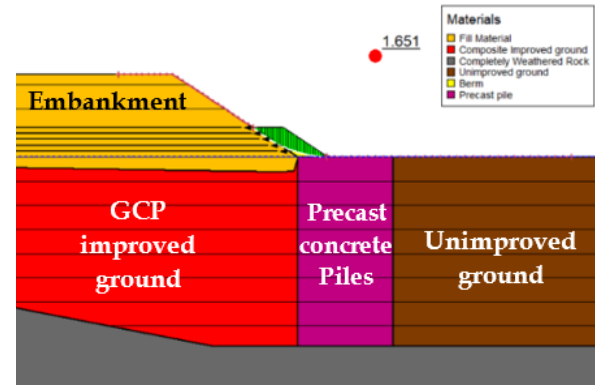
Slope stability analysis with the installation of precast concrete piles at the toe of the embankment
